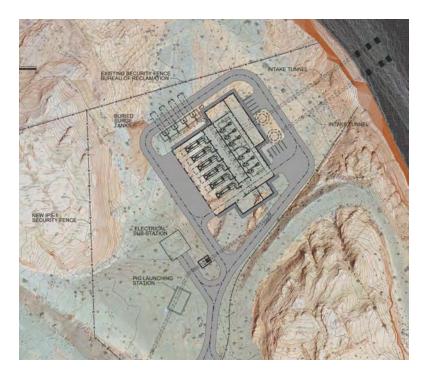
Site Plan for Lake Powell Pipeline Intake Pumping Station (LPP-IPS) with Natural Gas Supply Line and Generators Alternative
